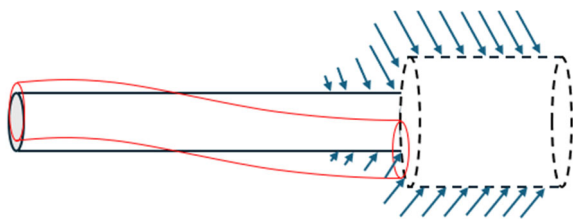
Enlargement excavation and existing pilot tunnel lining interaction mechanism (schematic diagram does not represent real deformation magnitude).
